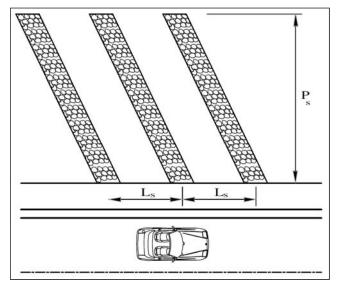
Plan view of groups of spur for repelling flow ^(8.9)
